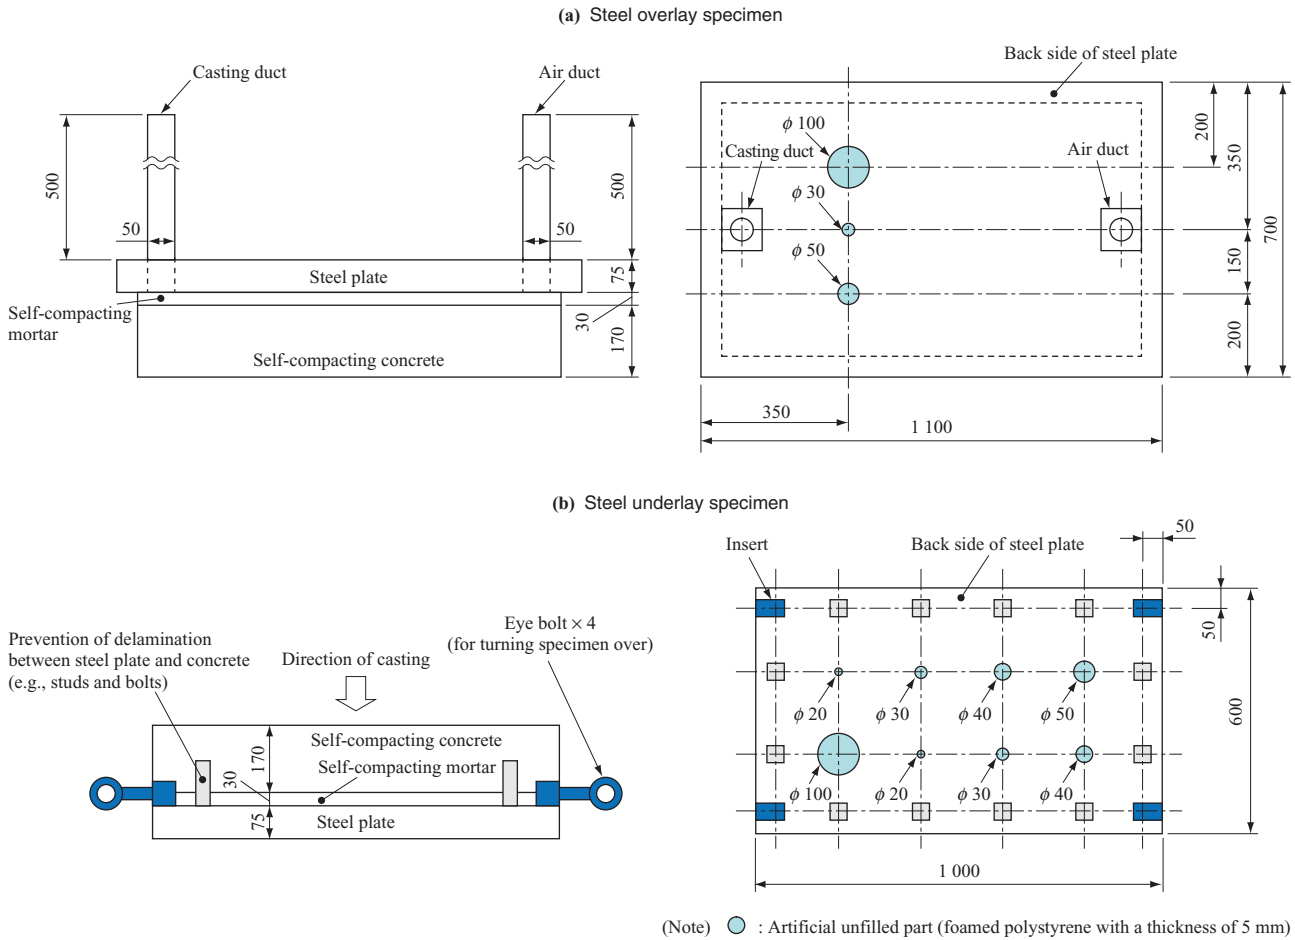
Specimens representing rigid connections between a reinforced concrete pier and a steel beam (unit:mm)
